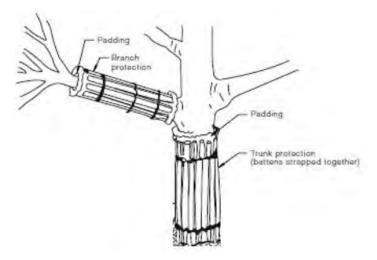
Example of trunk and branch protection (Source: AS 4970-2009).
